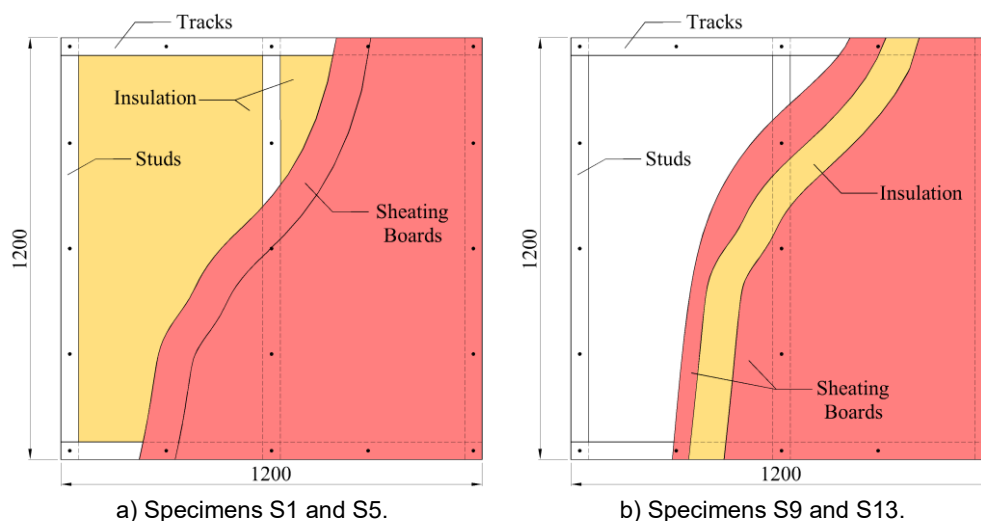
LSF wall with insulated cavity and external insulated wall (composite layers).
